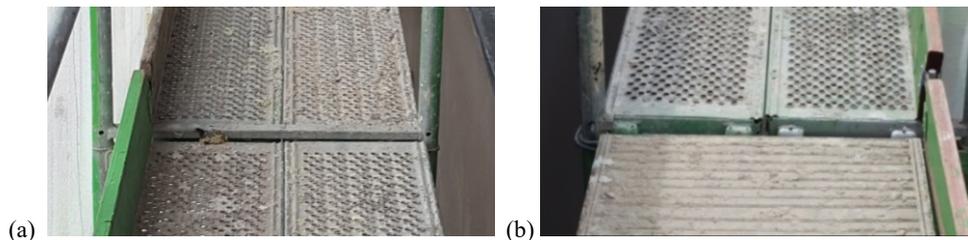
Lower cross-bar: (a) complete frame, (b) frame with lower cross-bar cut out.
